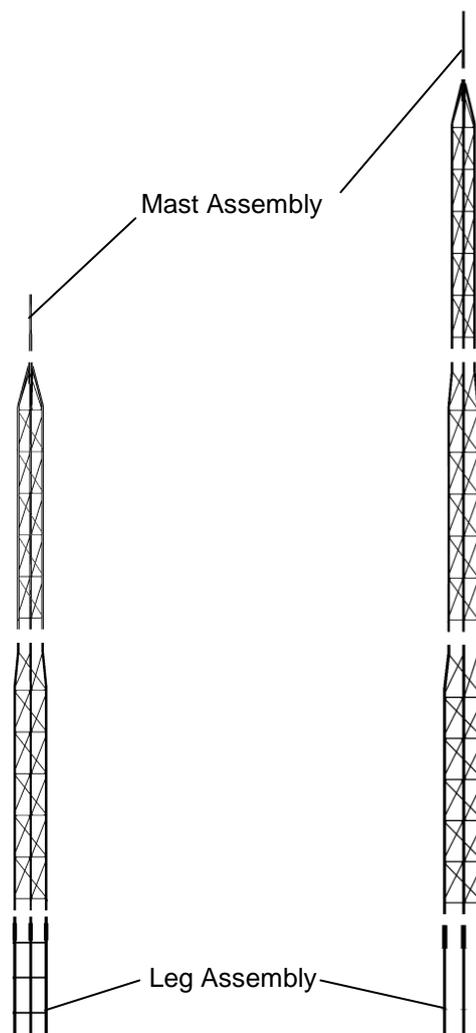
UT20 and UT30 Towers, showing Tower Sections
